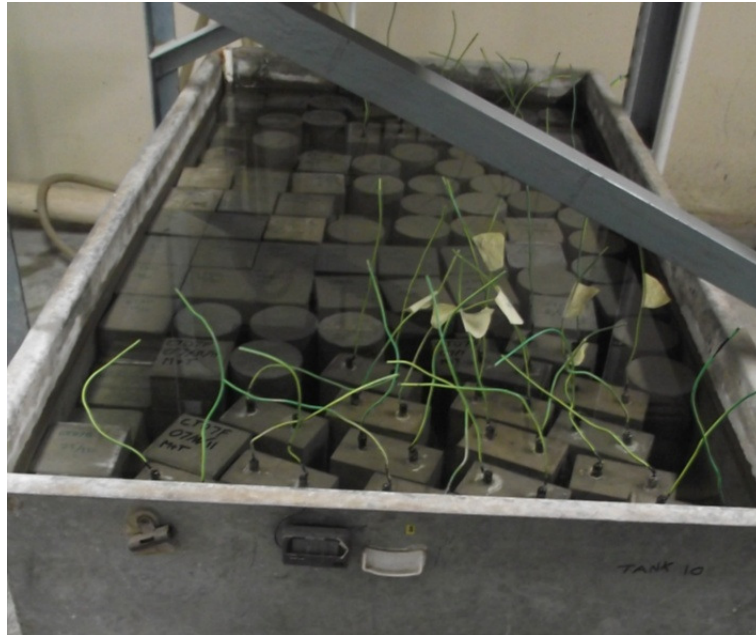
CURING OF CONCRETE SPECIMENS
